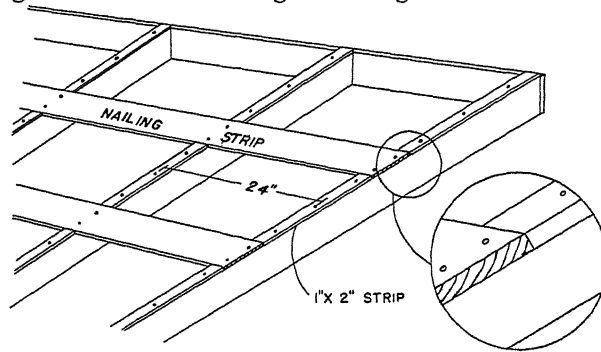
Method of attaching nailing strips to rafters. The strips of wood on rafters provide a solid nailing surface for side laps.
